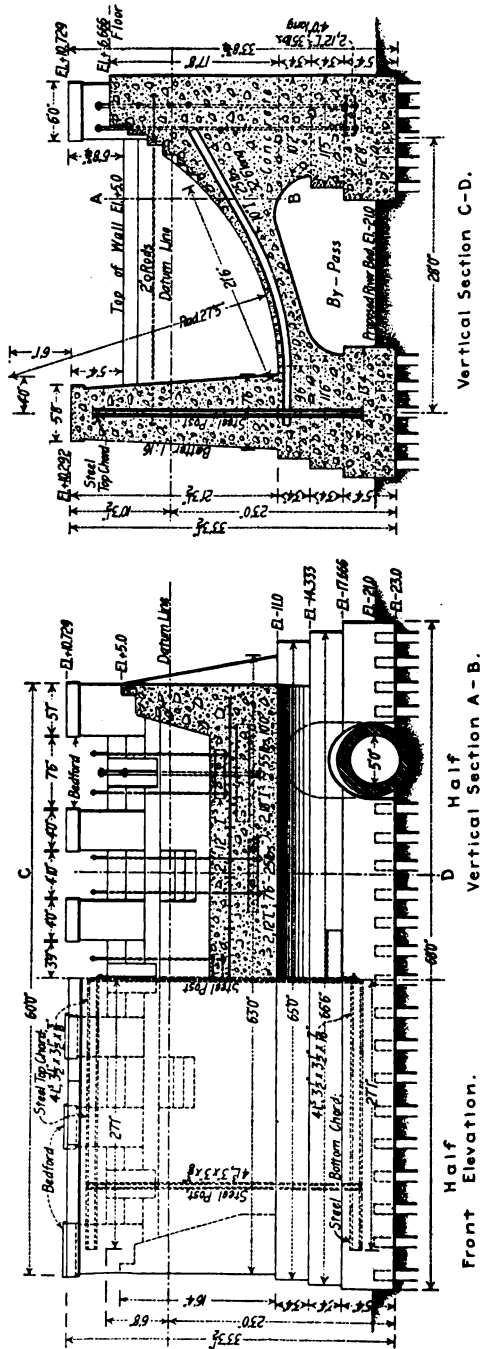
Reinforced Concrete Pier, Clybourn Place Bridge, Chicago.
